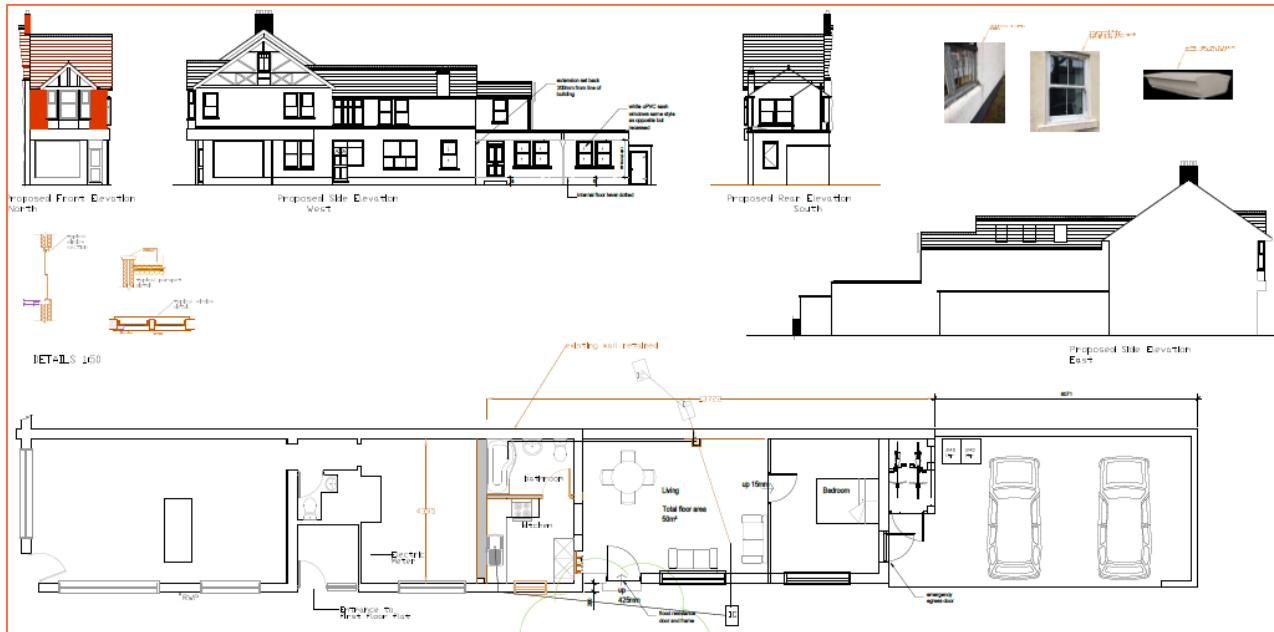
Proposed ground floor and elevation plan (Source: BPM Architectural Services)
